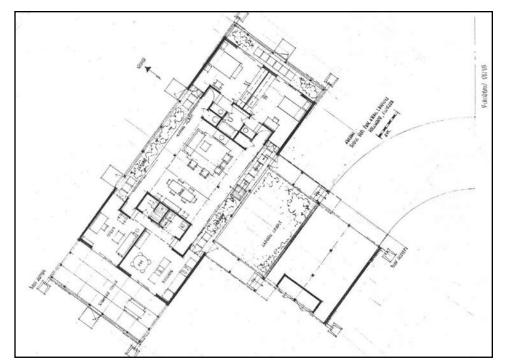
Floor plan of the LAWSON HOUSE (c. 1960). [Charles Reed, Jr. collection]
